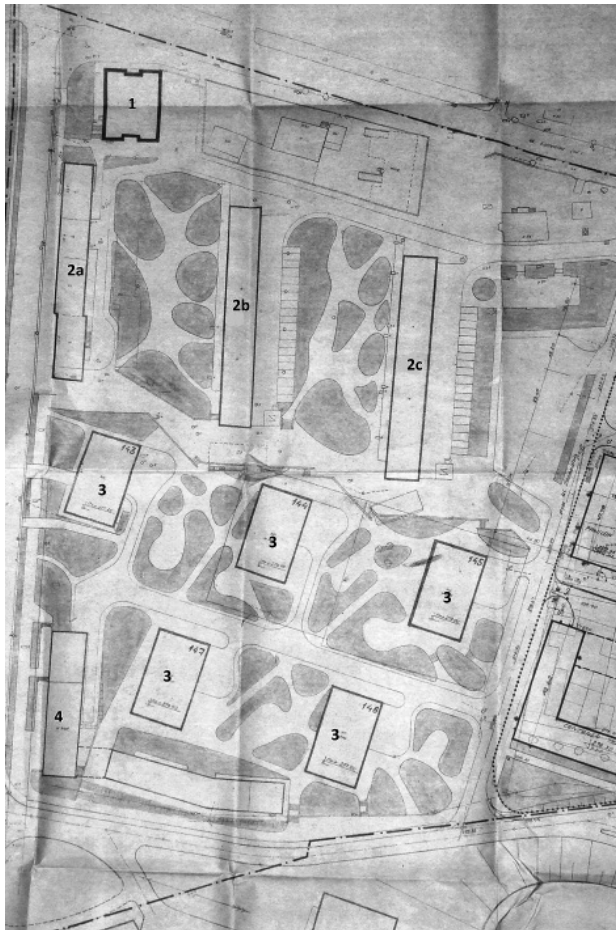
Spatial development plan for the so-called Block D–West in Katowice, M. Krol, 1959. AKCH. 1. “Gornik I”. 2a. Complex of buildings along Armii Czerwonej Street, T. Lobos. 2 b–c. Houses with “noses”, M. Krol. 3. Tower blocks, M. Krol. 4. “Book House”, J. Jarecki.
